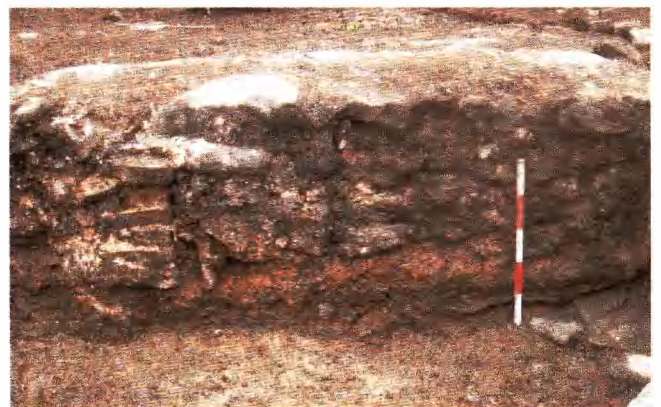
Victorian tenement wall 1061 built over, and incorporating, structure 1063, looking south-west.
